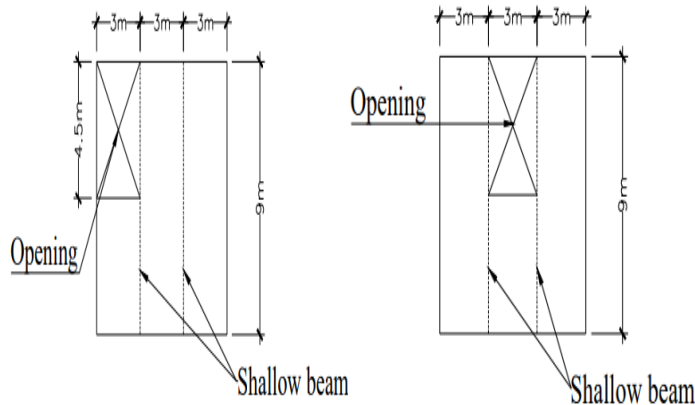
opening position 1 for three panel slab (o1) Fig-4: opening position 2 for three panel slab (o2)
